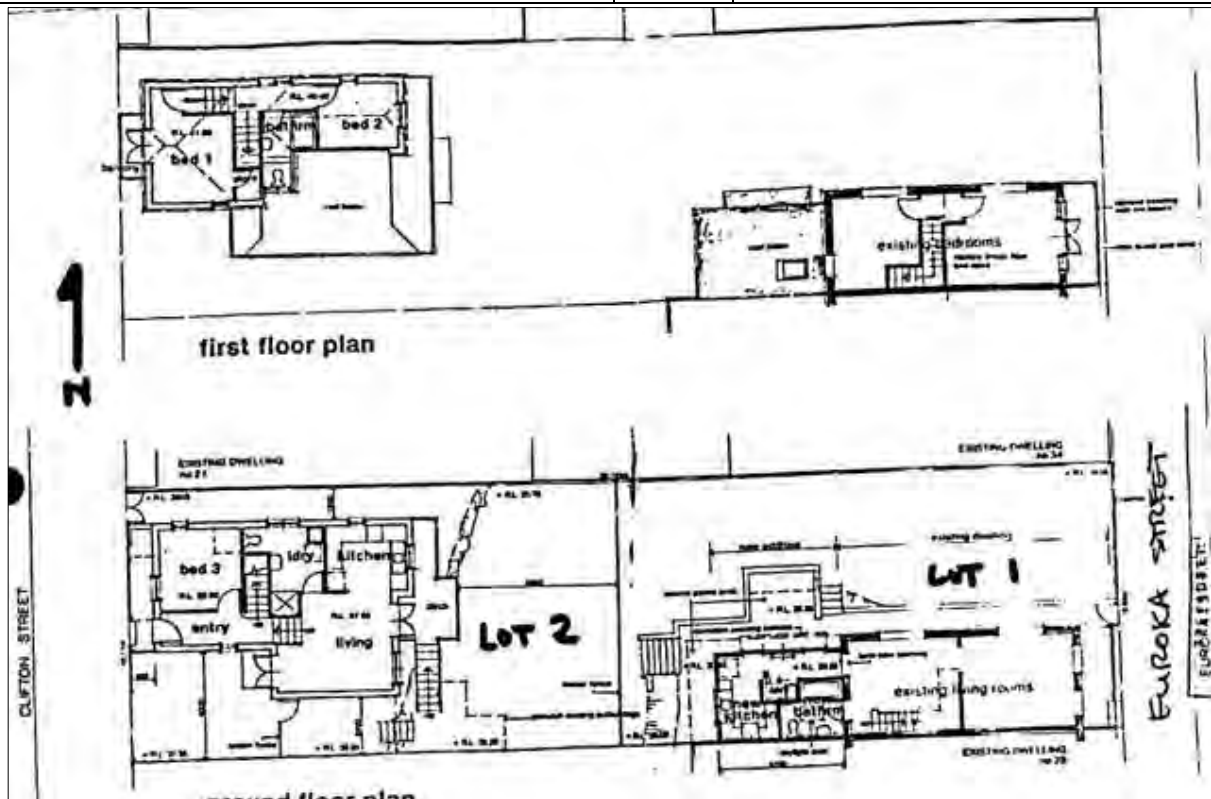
Floor Plan of No.30 Eureka Street (Lot 1)
